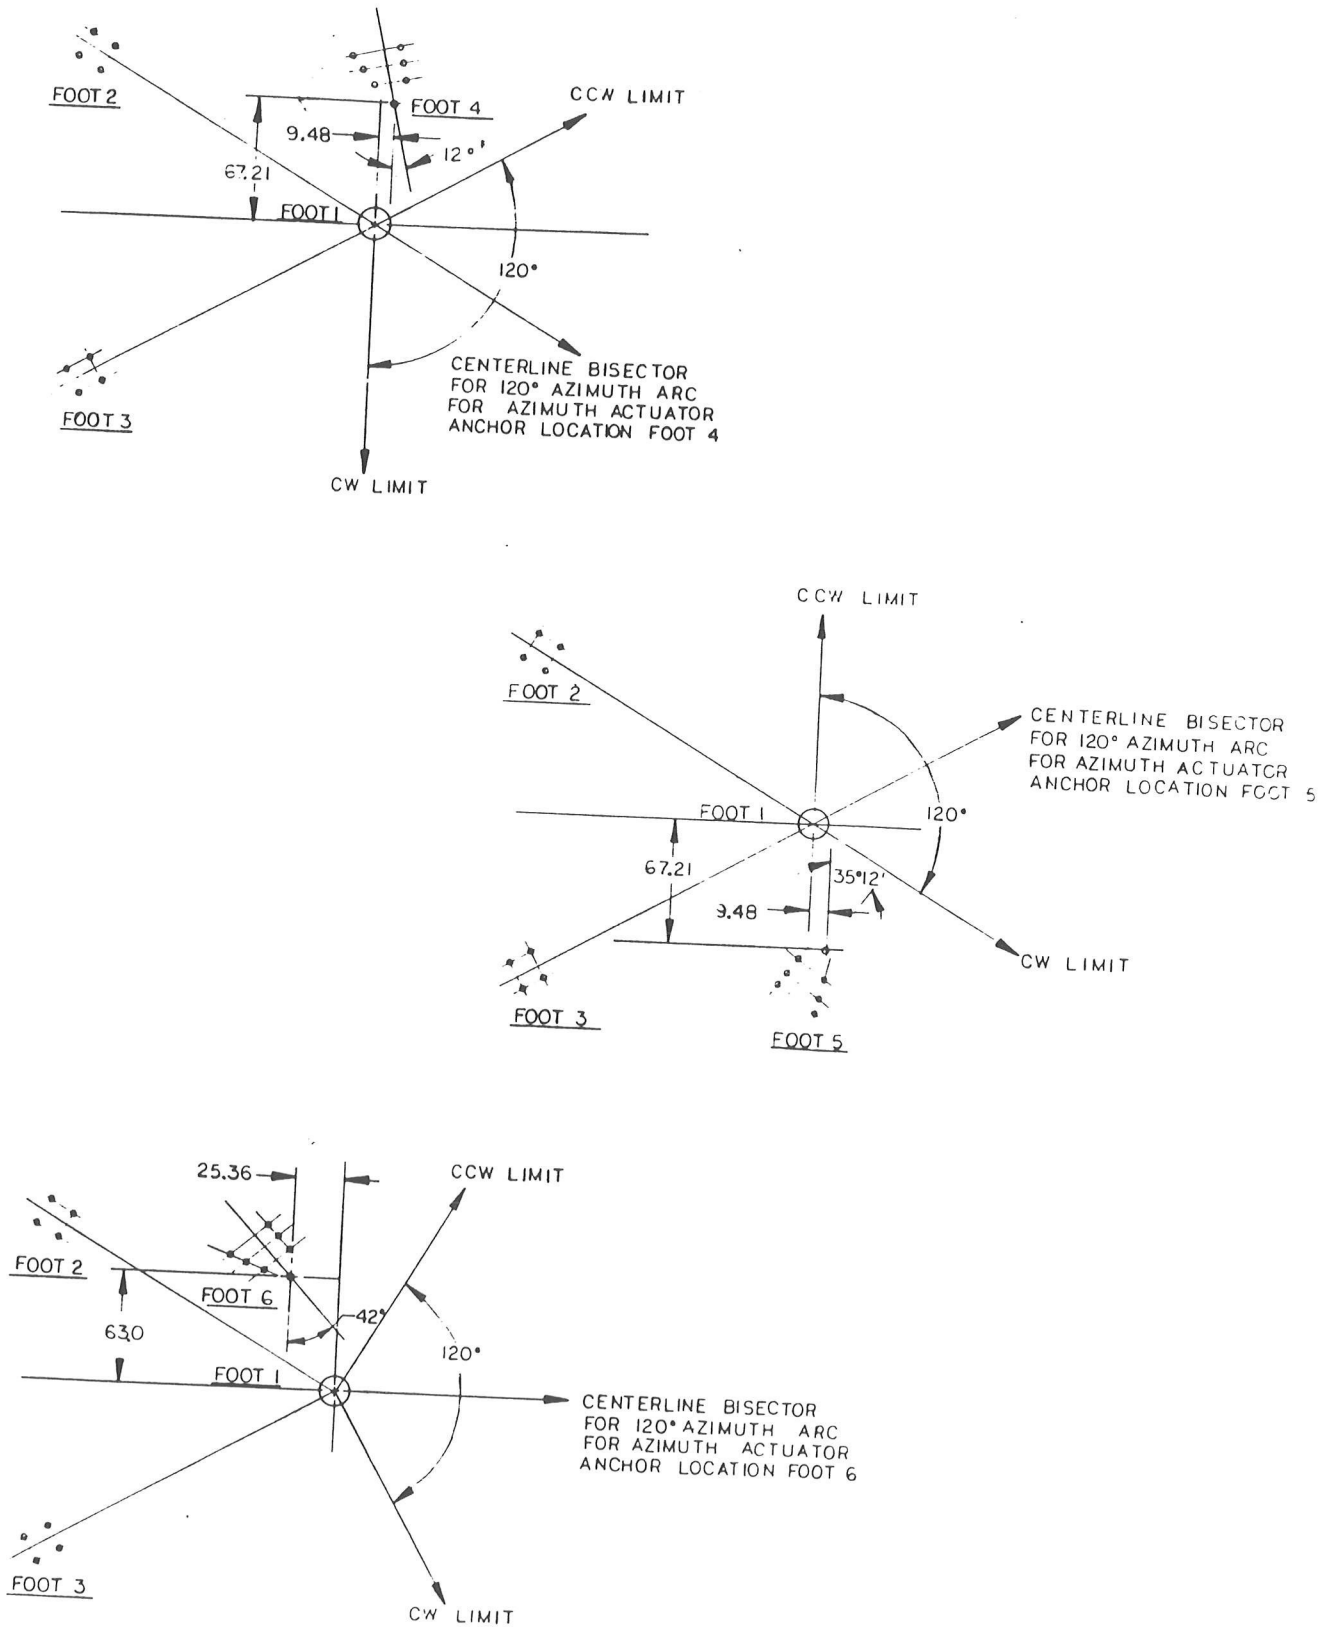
Foundation Plan, 120° Azimuth Mount (Sheet 2 of 2), 360161
